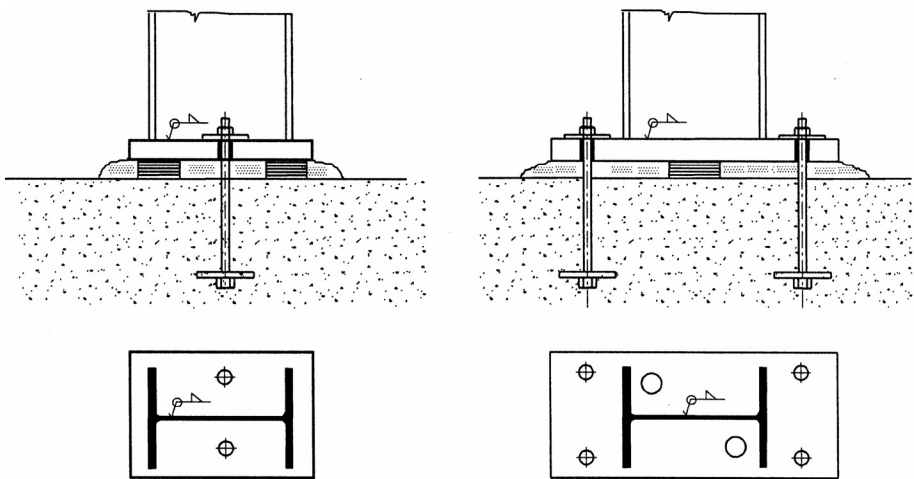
The column base detailing, configured with two and four anchor bolts. The headed anchor bolts and the un-stiffened base plates are shown as one example of a fixing system.
